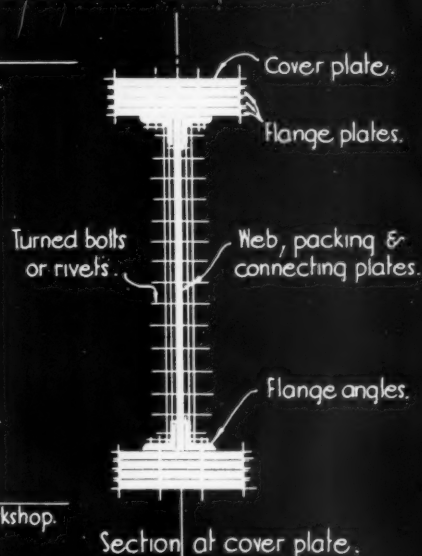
ADJACENT SPLICES IN MEMBERS OF SITE-JOINTED PLATE GIRDER.
